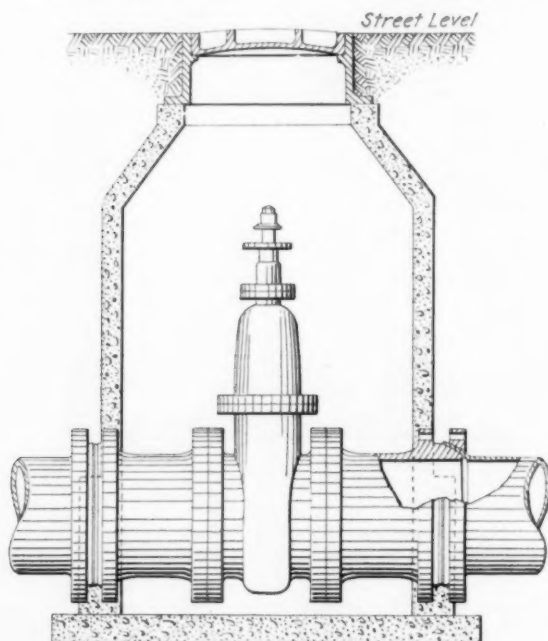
VALVE BOX WITH VALVE IN PLACE
